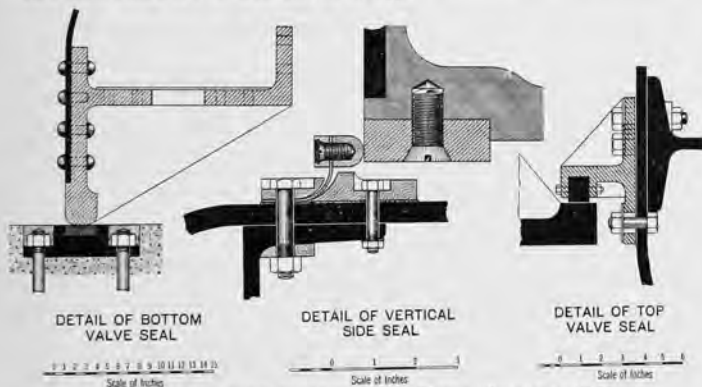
PANAMA CANAL RISING STEM GATE VALVES: DETAILS OF SEALS.
